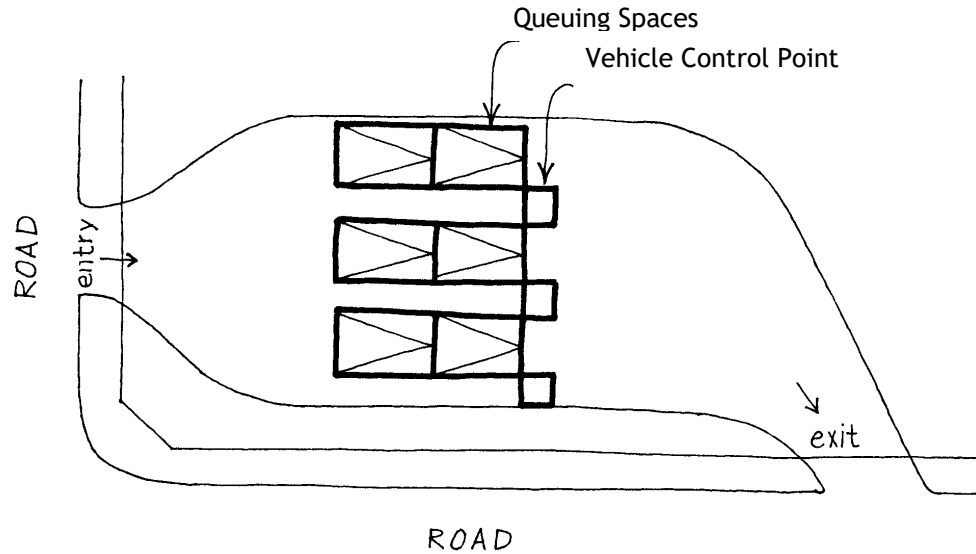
queuing lane & queuing space showing required on-site arrangement
